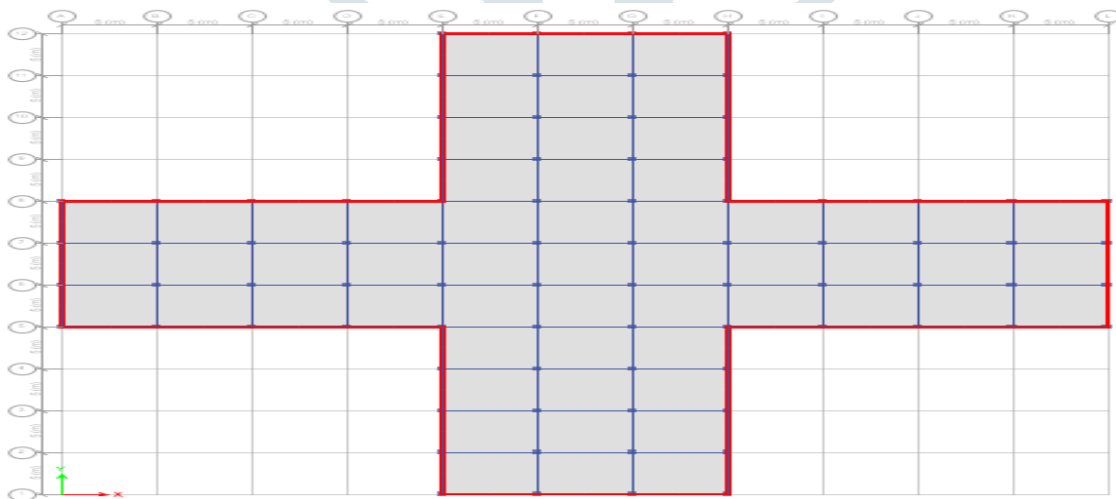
Plan view of plus shape with Shear wall at Alternate floor with blast loading
